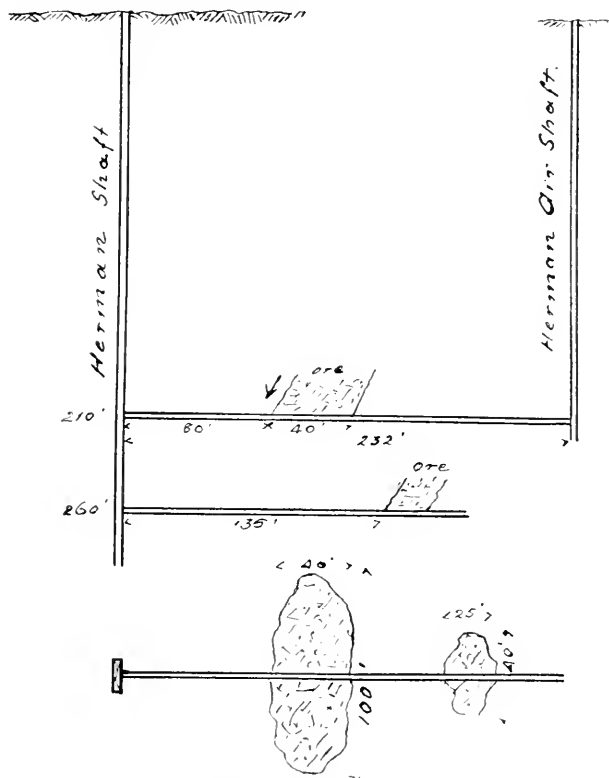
Sulphur Bank Mine—Section and plan of Herman shaft.
